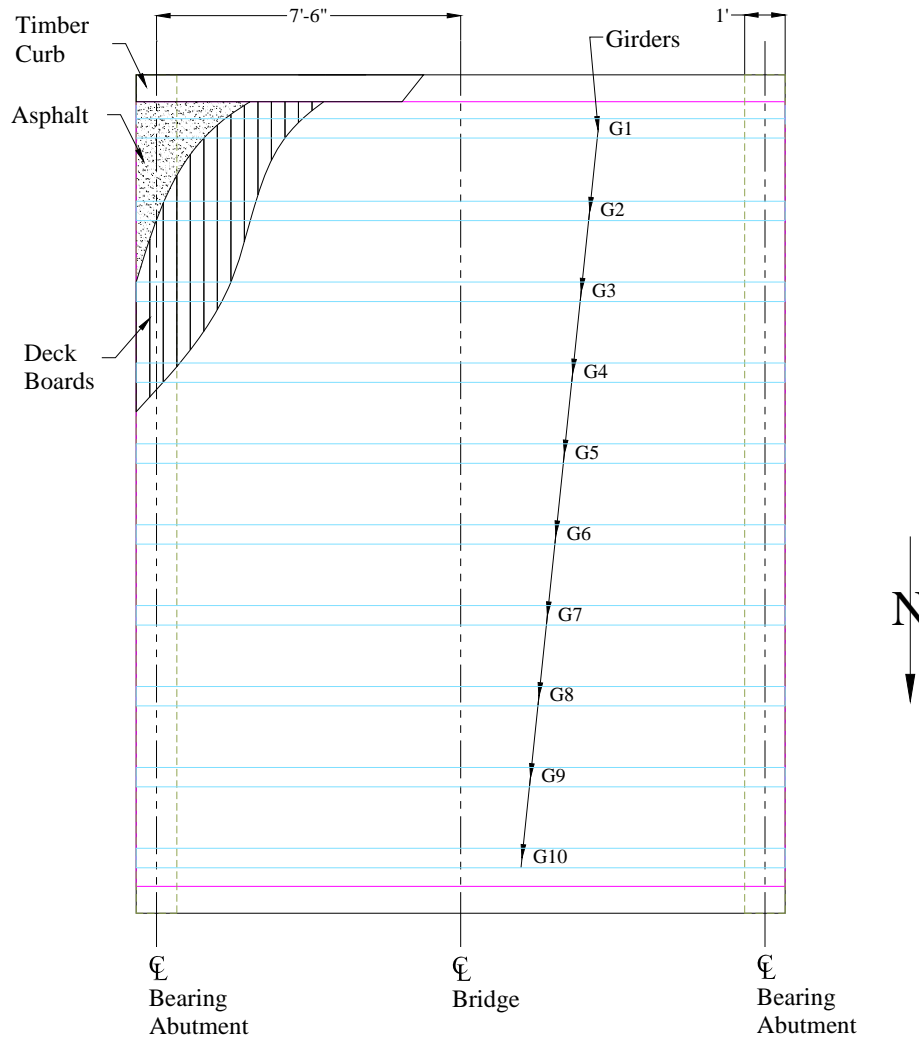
Plan and Profile Layout of Chestnut Cove Creek Bridge
